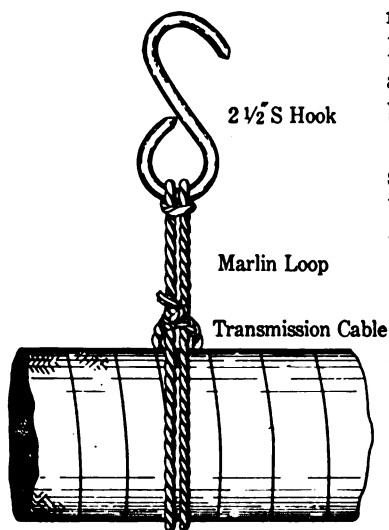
METHOD OF FASTENING S HOOKS TO AERIAL CABLE
